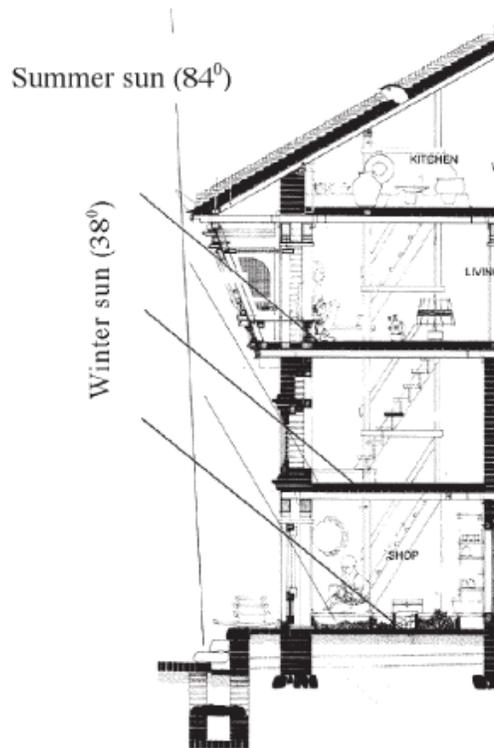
Section of Traditional House Showing Light Penetration through Openings (Source: Korn, 1976)
